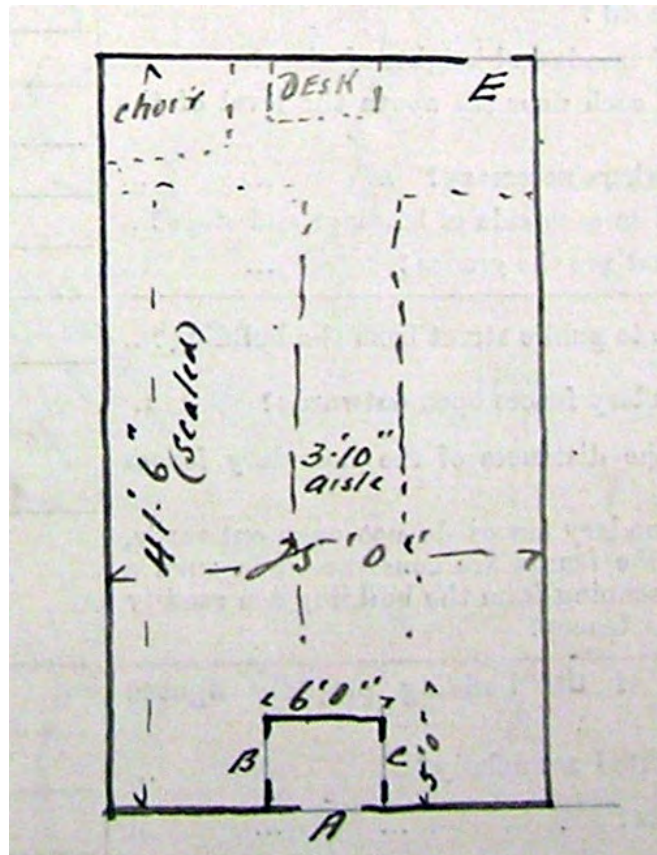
St. John's Anglican Church Floor Plan, 10 May 1906, prepared by the inspector of the Public Health Department.
